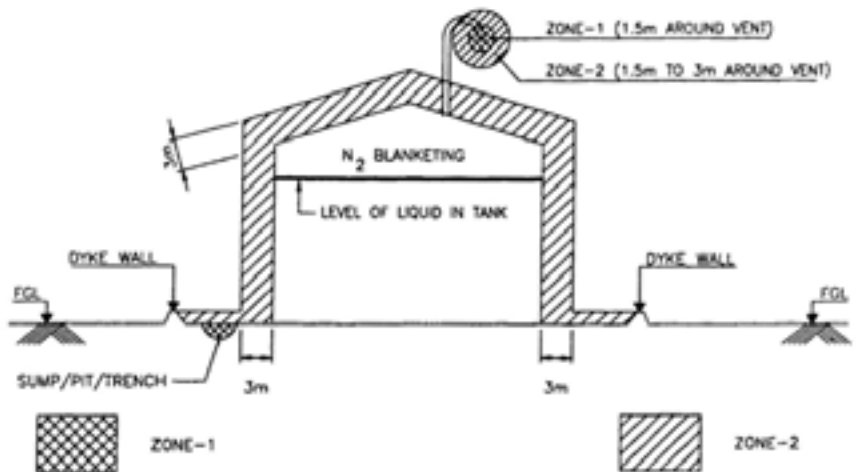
FIXED ROOF TANK (WITH N₂ BLANKETING)
